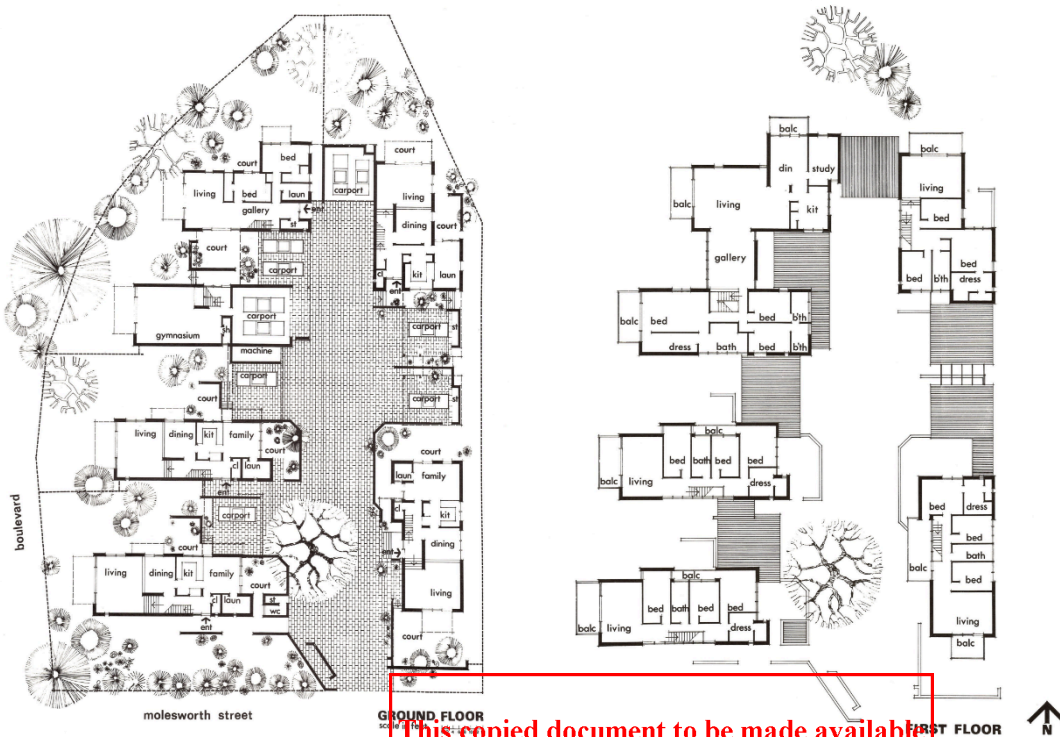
The ground and first floor plans of Merchant Builders' Molesworth Street Townhouse Development in Kew, winner of the RVIA's Bronze Medal in 1970.
